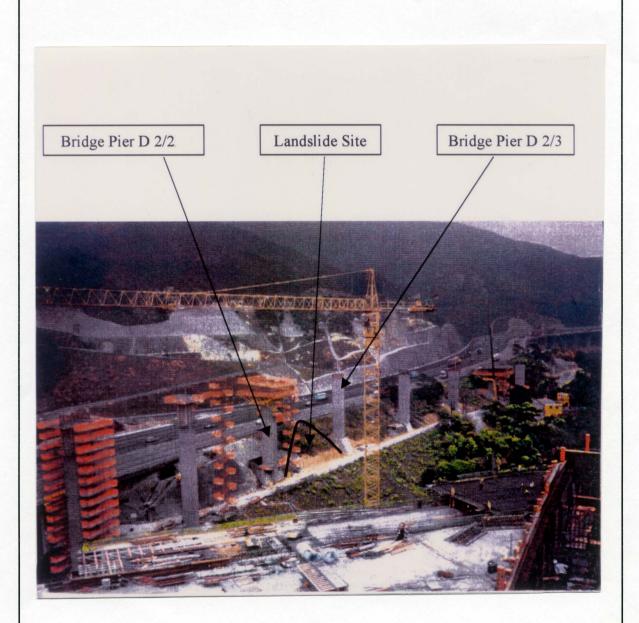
View showing the Construction of Bridge Piers D2/3 and D2/2 for Route 3 Adjacent to Tuen Mun Road (Photograph Taken in January 1997)
